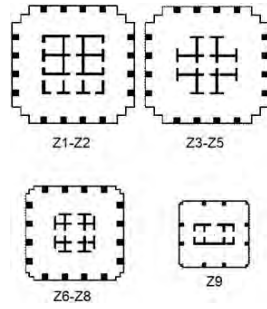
Typical layout plan for Scheme 2 (Source: Guangjing Sha)
